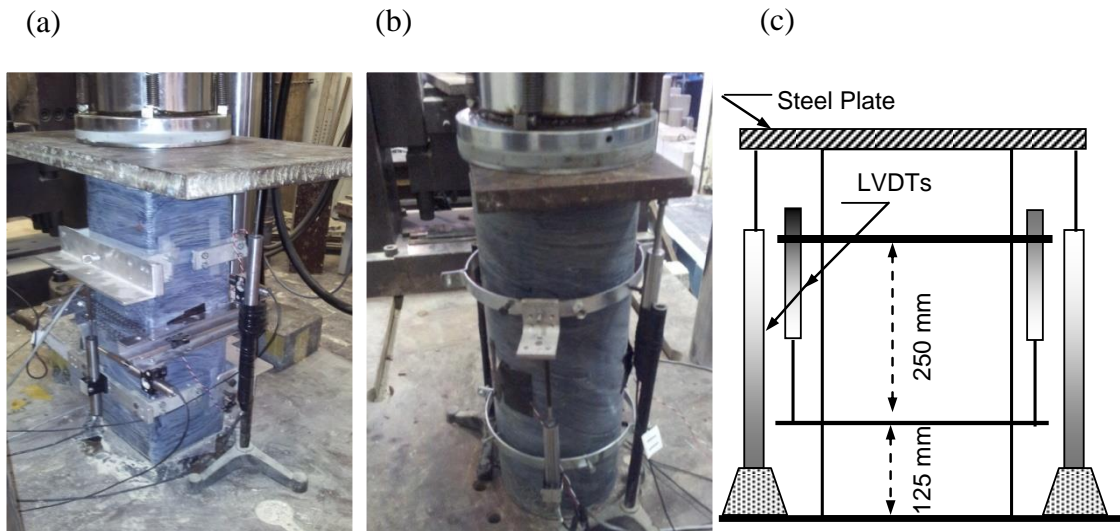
Instrumentation and test set-up: (a) Specimen *SF1*, (b) Specimen *CF1*, (c) LVDTs on square specimens
